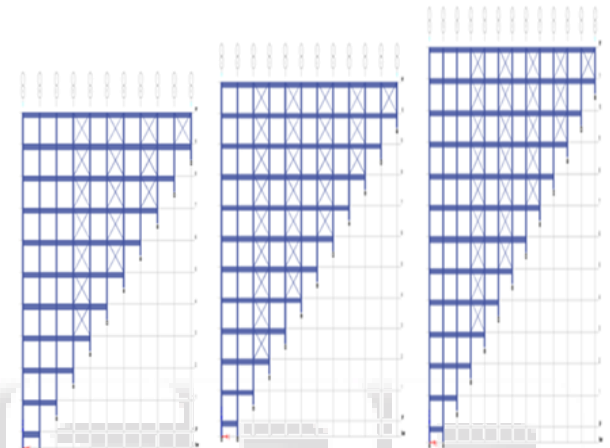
Building is of G+9, G+10, G+11 storeys, constructed in step back building frames considering steel bracings
